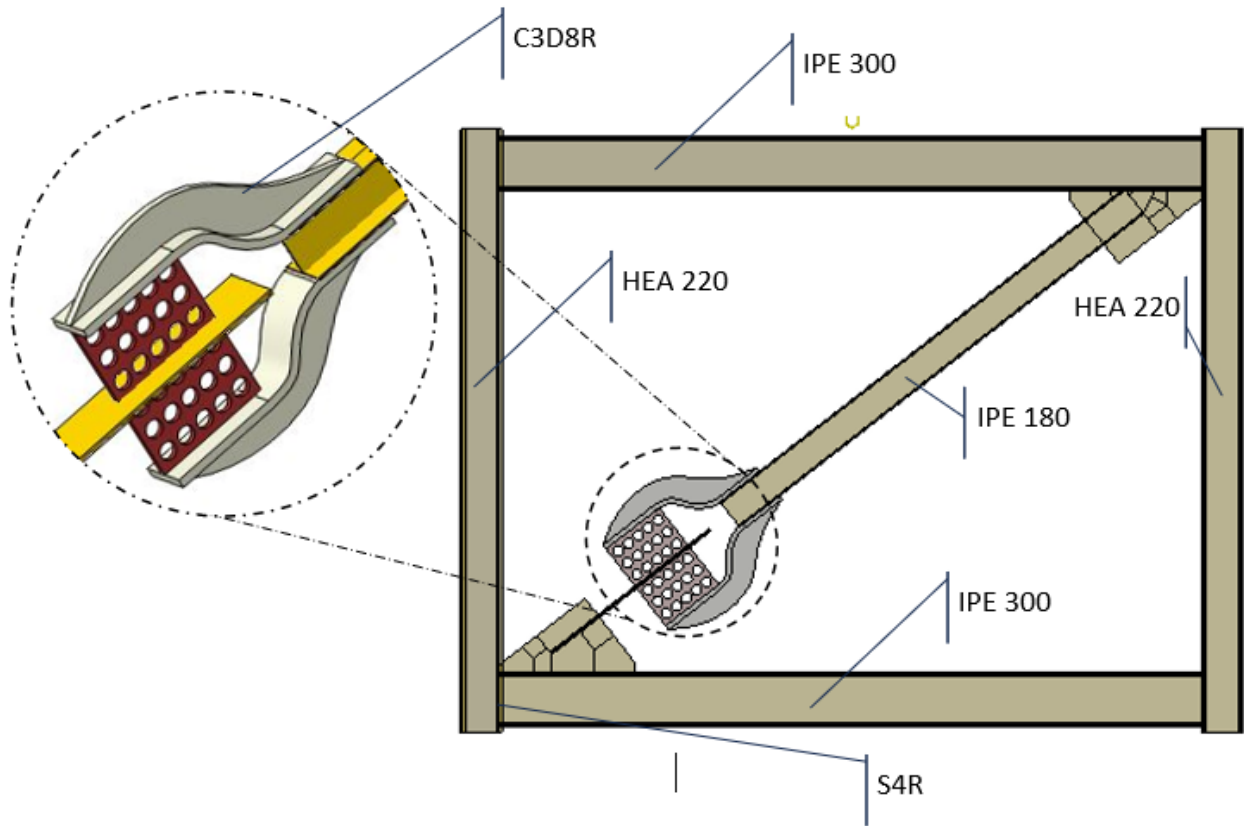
Details of Sections Along with Element Types in the Proposed Damper
